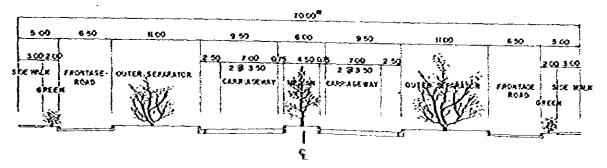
TYPICAL CROSS SECTION MANILA-BATAAN COASTAL ROAD (C-4 TO C-6) INITIAL STAGE
